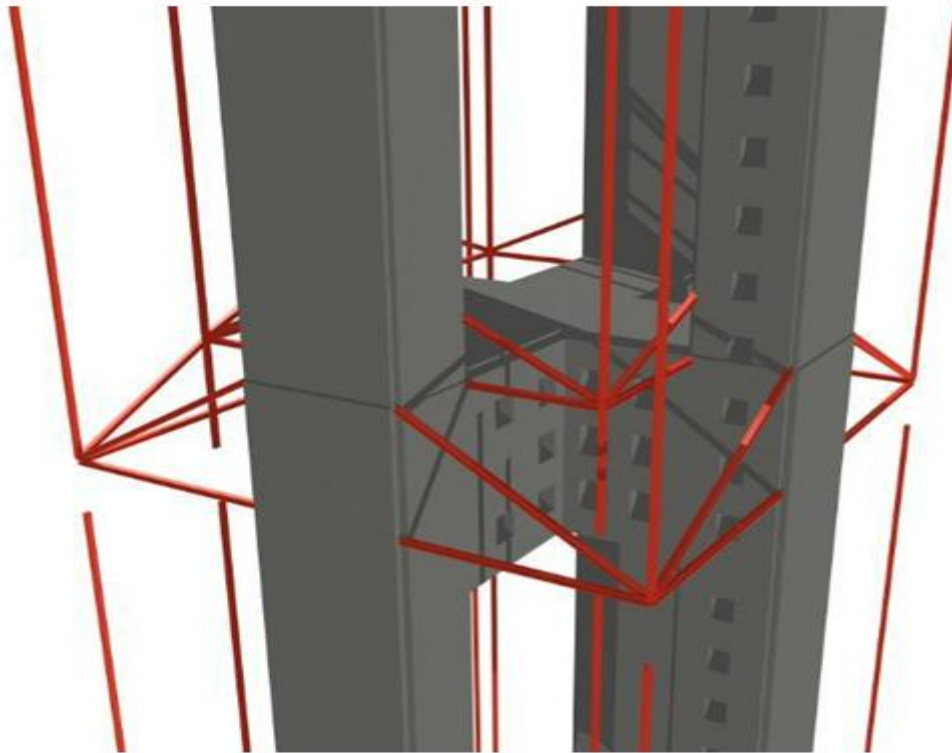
Floors around station, showing the framework connecting to Colossal columns via diagonals and the horizontal tubing connecting the legs
